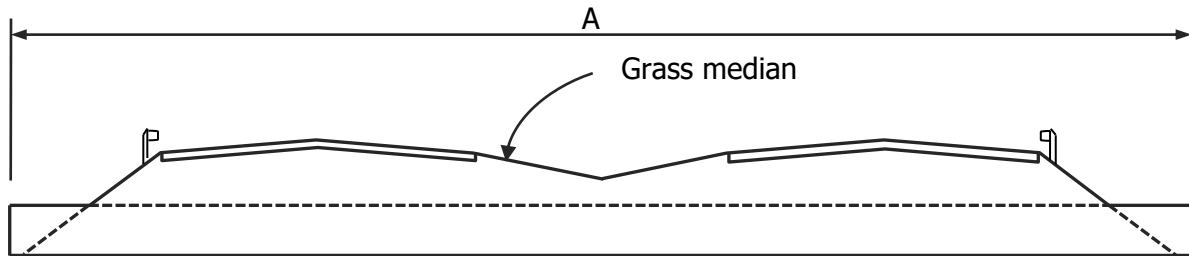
Cross-section view of a pipe bridge under fill, or culvert under fill.
